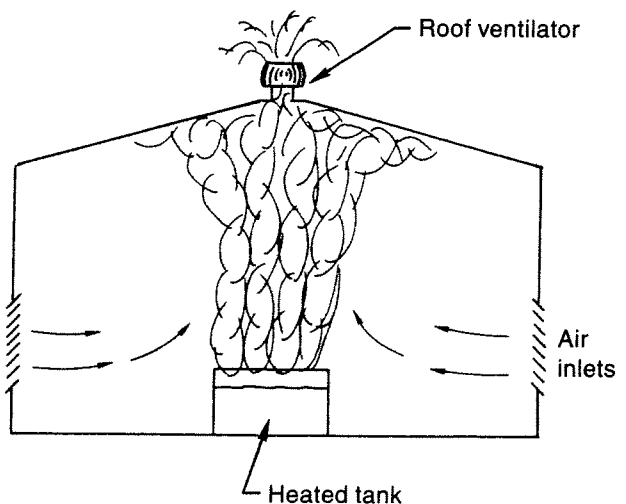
Natural ventilation as heated air rises around a hot process. This is not acceptable if a worker bends over the tank and breathes the contaminants.
